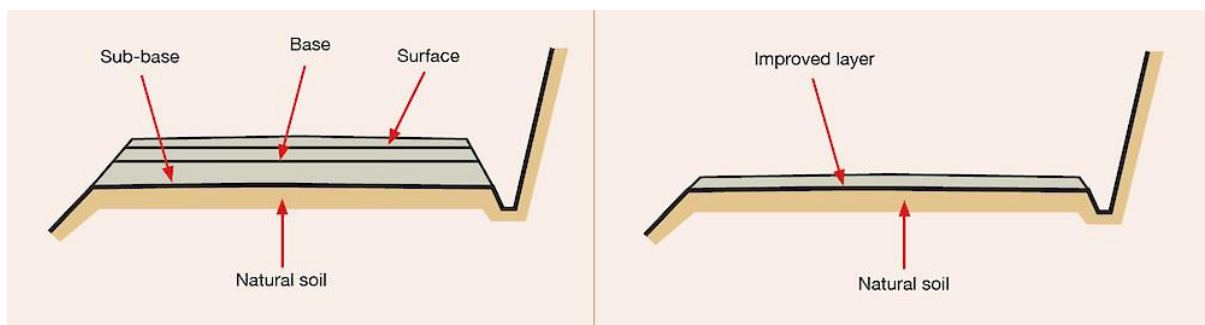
Typical pavement layer structures used in New Zealand Forestry (NZ Forest Owners Association, 2020).
